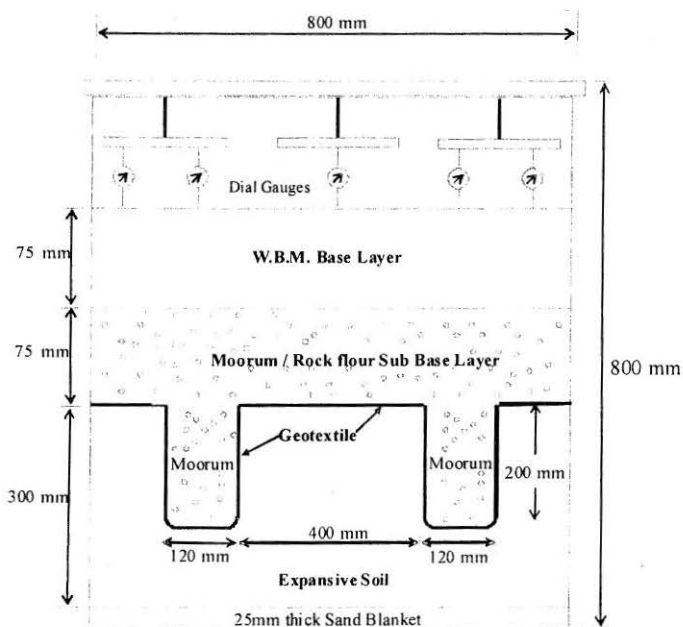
Cross-Section of Model Reinforced Flexible Pavement System used in the Studies
